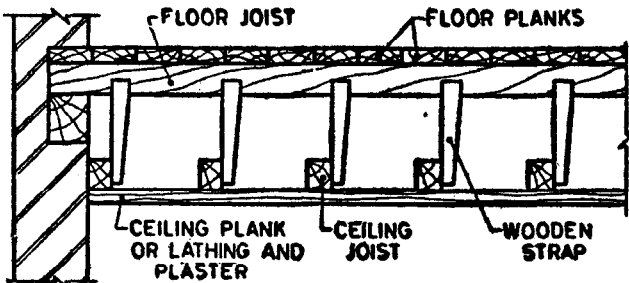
CLOSED CEILING JOISTS AND PLANKS SUSPENDED FROM FLOOR JOISTS
